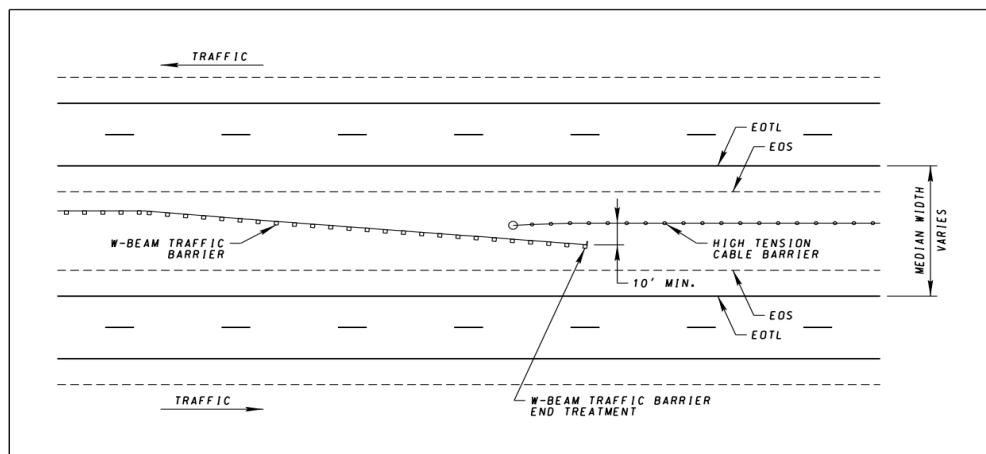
High-Tension Cable Barrier/W-Beam Traffic Barrier Transition Layout
